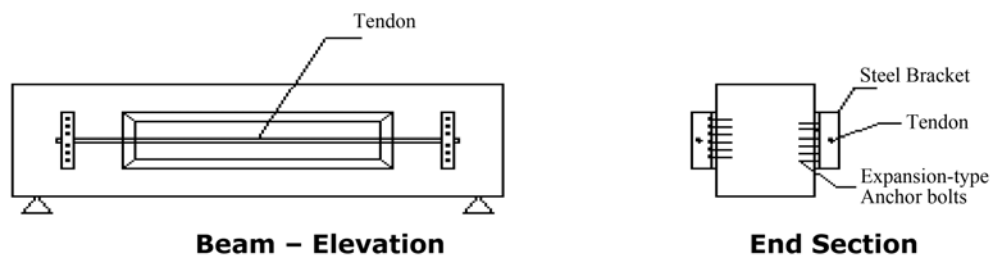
Anchoring of external prestressing at the sides using expansion - type anchor bolts
